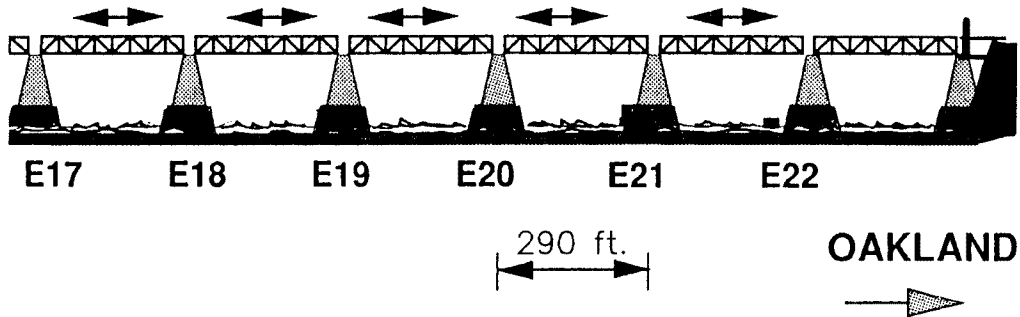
Damage to single-span trusses (piers E17 to E22). (Trusses in five spans moved longitudinally)<sup>28)</sup>.
